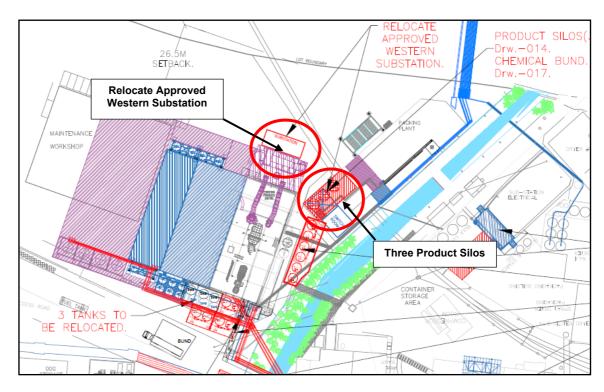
Plan view of location of proposed additional product silos and relocated substation.
